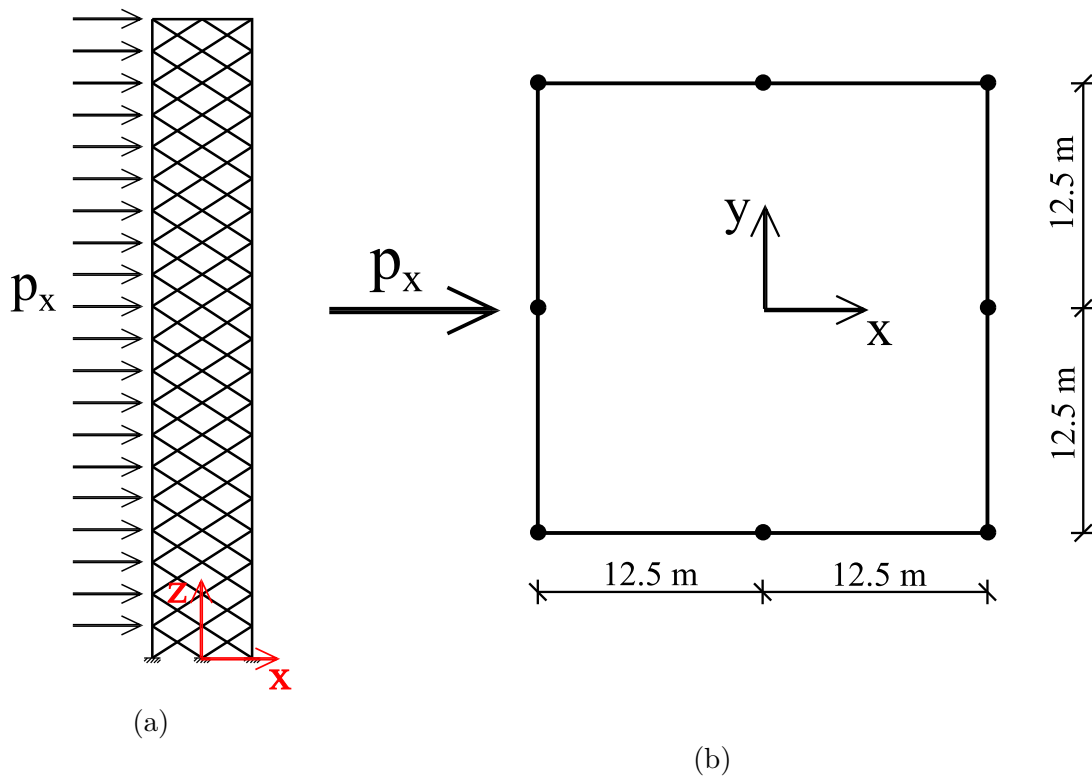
Diagrid structure. (a) Front view; (b) Floor plan
